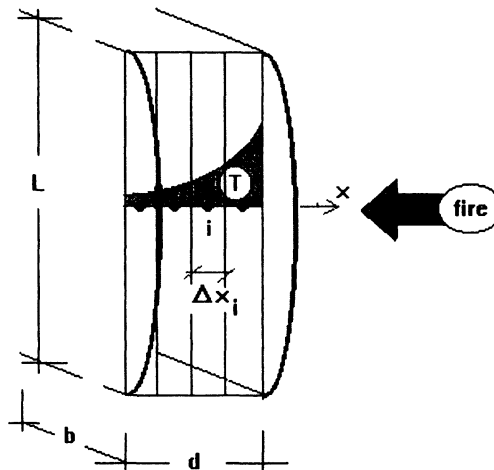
Schematic depiction of the concrete wall exposed to fire.
